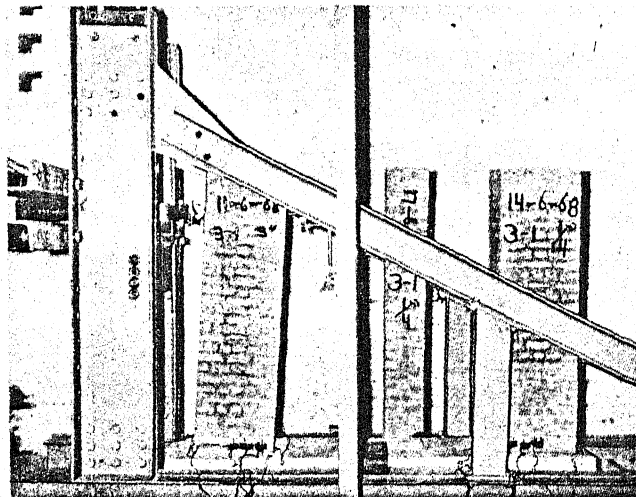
SHOWING THE BRICK COLUMN AFTER THE LATERAL LOAD TEST
